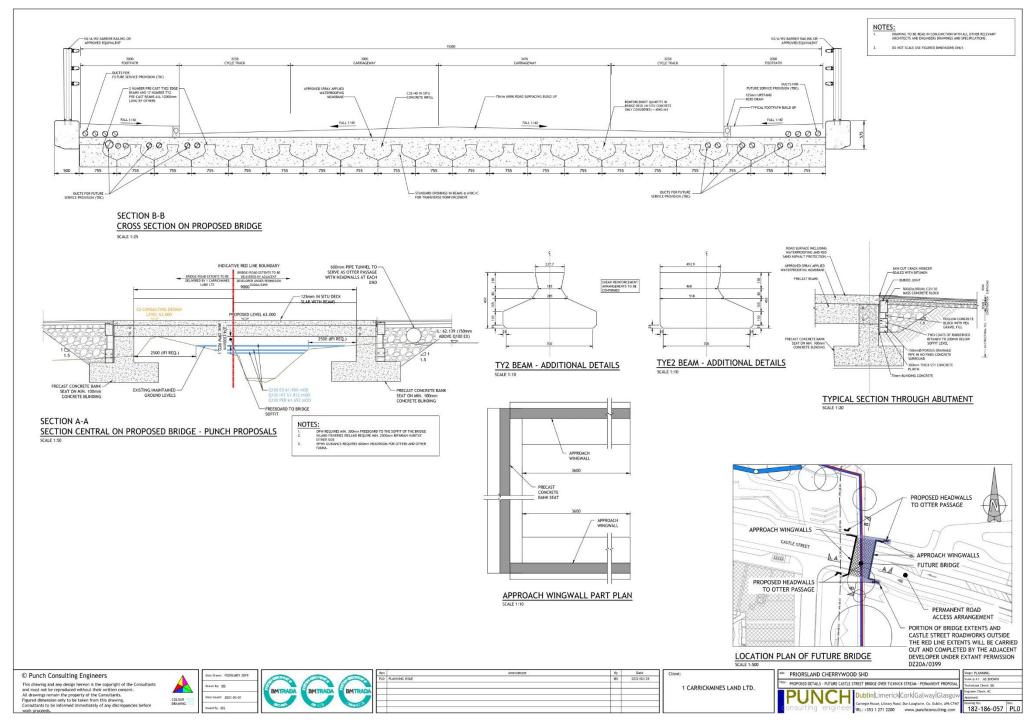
Proposed future Castle Street bridge over Ticknick Stream – Permanent Proposal
